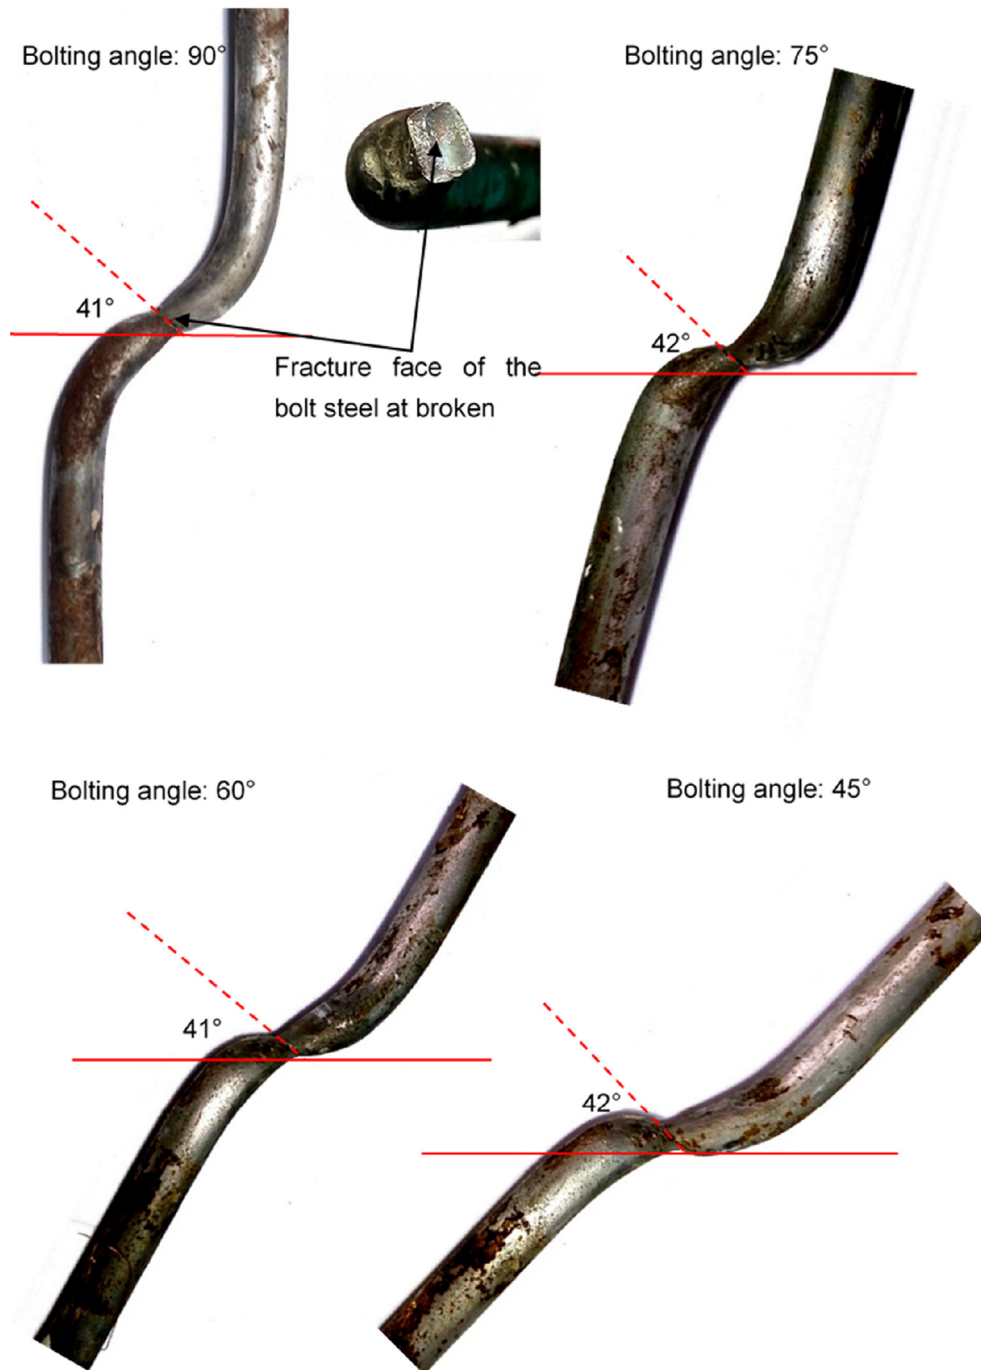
Angles between the fracture surface of the bolt and the joint surface with different bolting angles.
